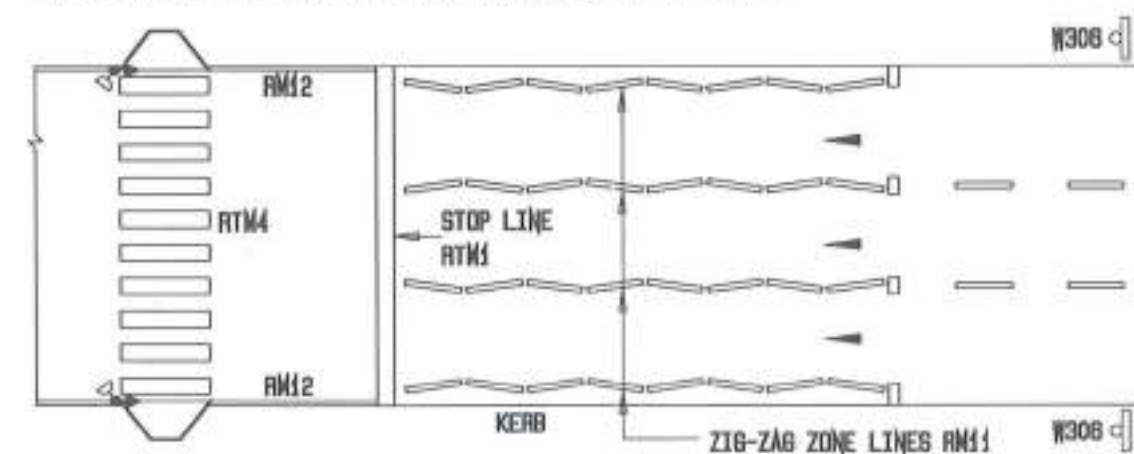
Multilane One-way Traffic Road with Unsignalised Crossing
